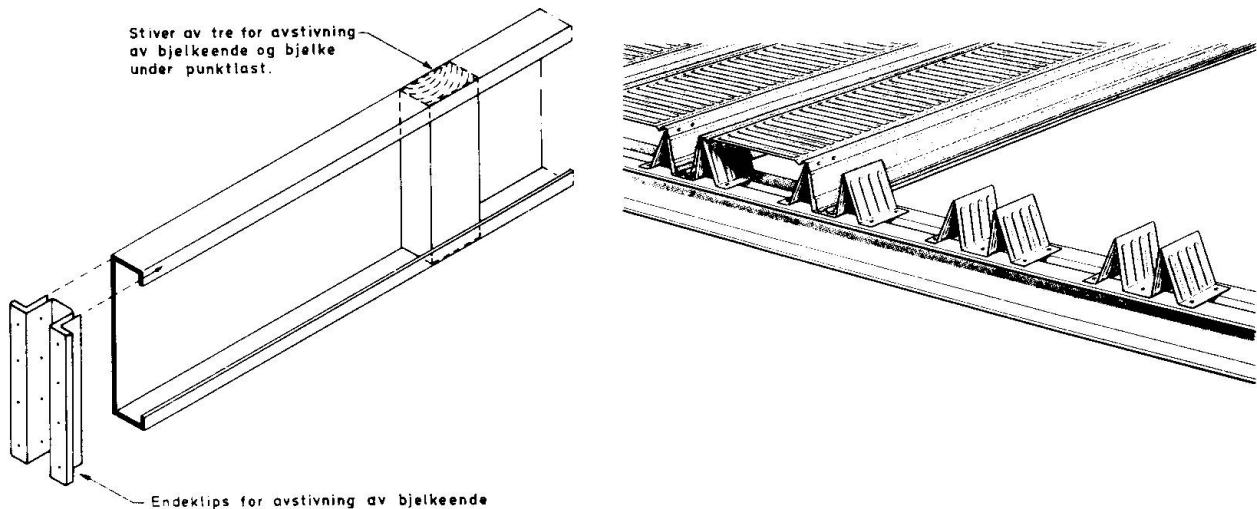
Example of local stiffeners (after [2]) and trapezoidal steel sheeting (PLANNJA) occasionally used as floor structural element.
